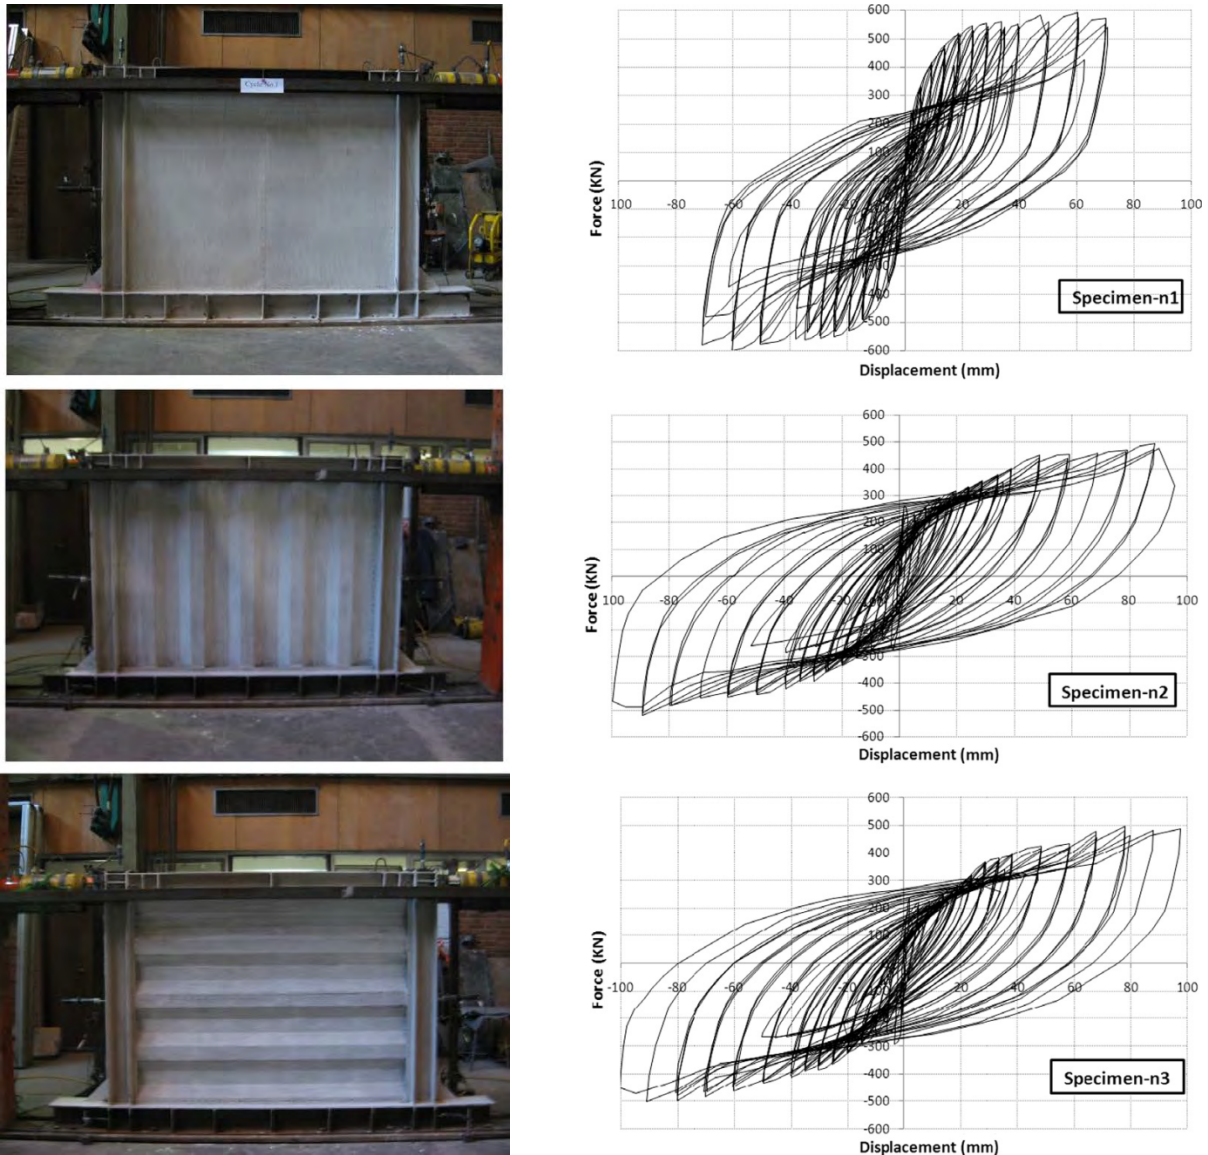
Steel shear walls and their hysteretic behavior (from [14]). From top to bottom: unstiffened shear wall; trapezoidally vertical corrugated shear wall; trapezoidally horizontal corrugated shear wall
